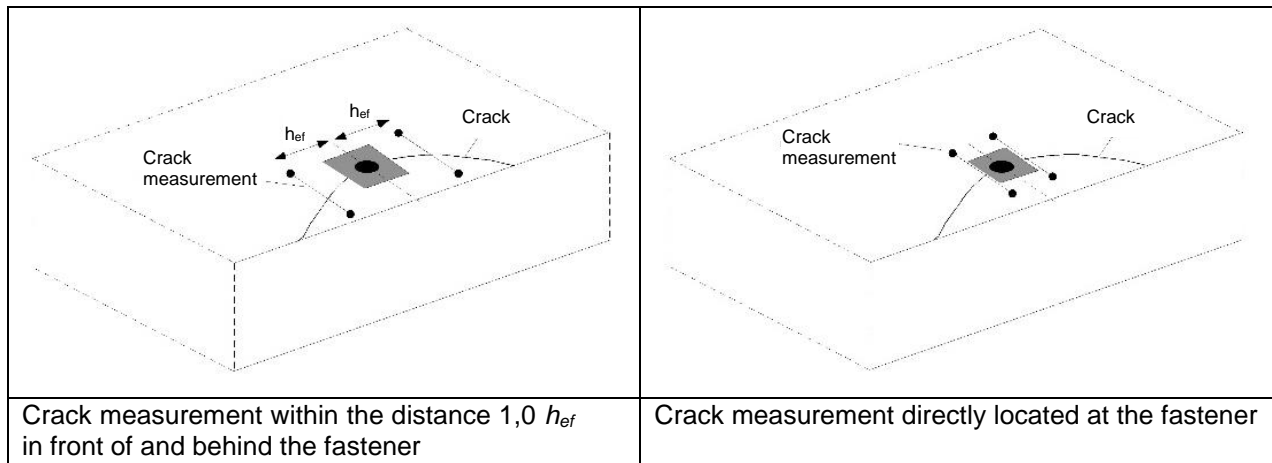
Examples for measuring points of crack width
